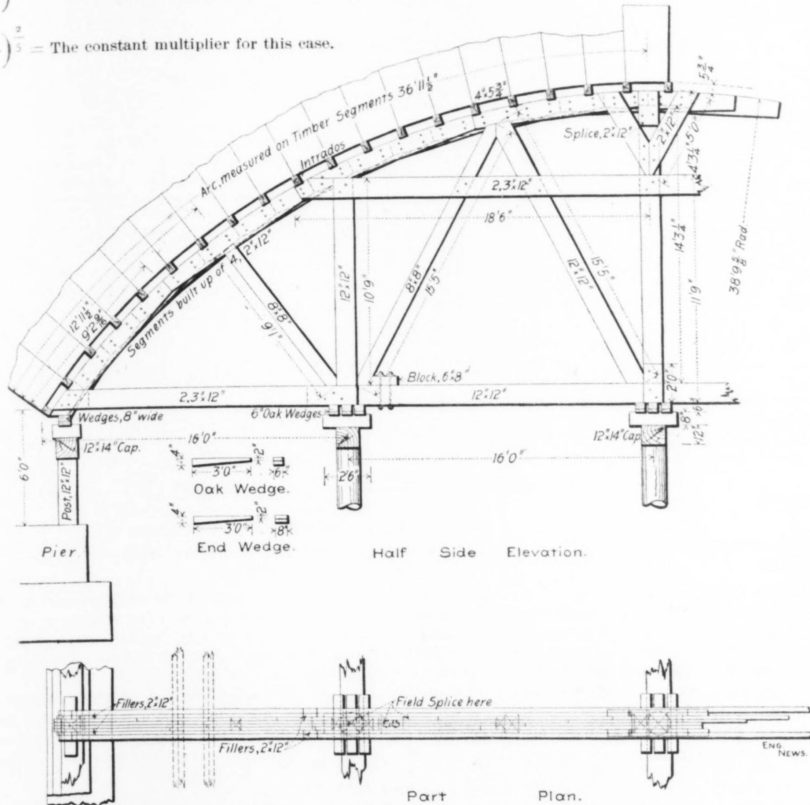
TRUSS RIBS FOR CENTERING OF STONE ARCH BRIDGE, C. M. & ST. P. RY.
